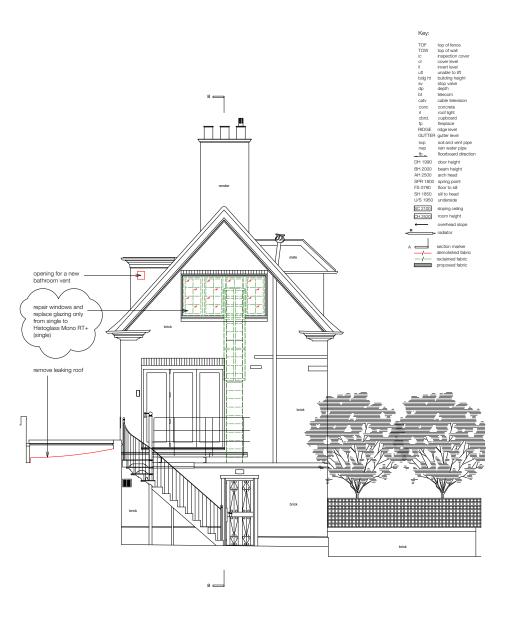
Existing rear elevation and section through roof of outbuilding with demo & reclaimed marked.
